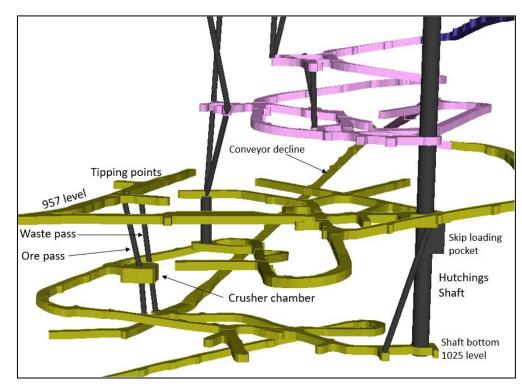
Crusher and Shaft Loading Arrangement – existing excavations.
